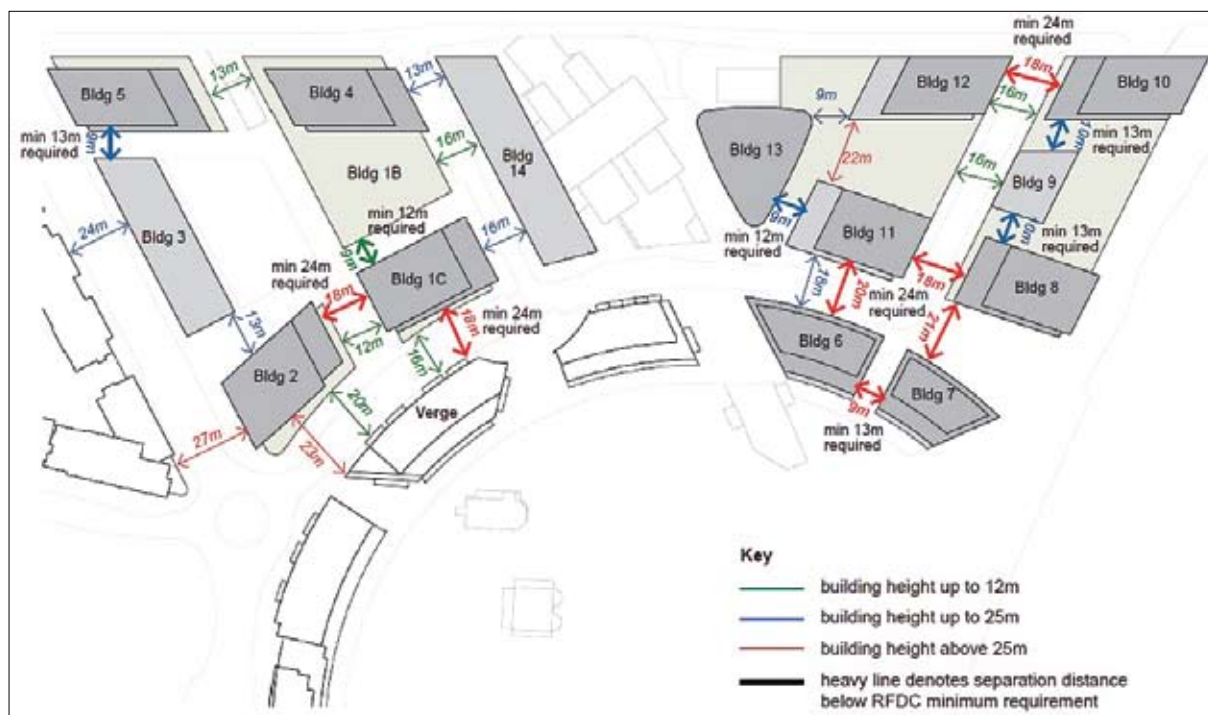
Diagram indicating building separation distances of indicative floor layout.
